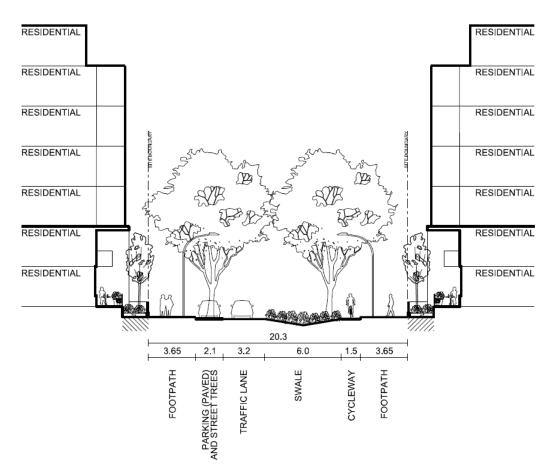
Section C – Local Street Type 1 Typical Section – 20.3m (Sam Sing Street south)
